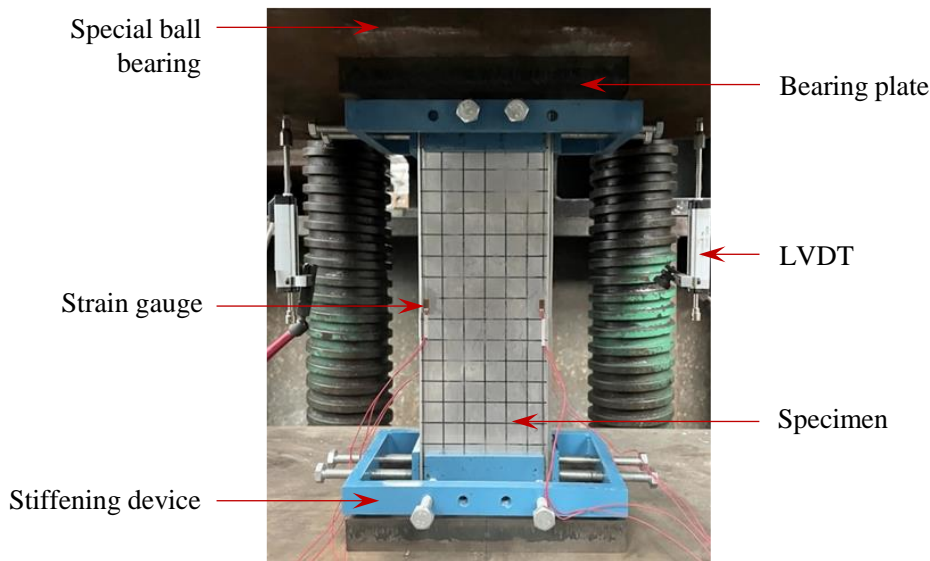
Arrangement of CFSS built-up section stub column test rig.
